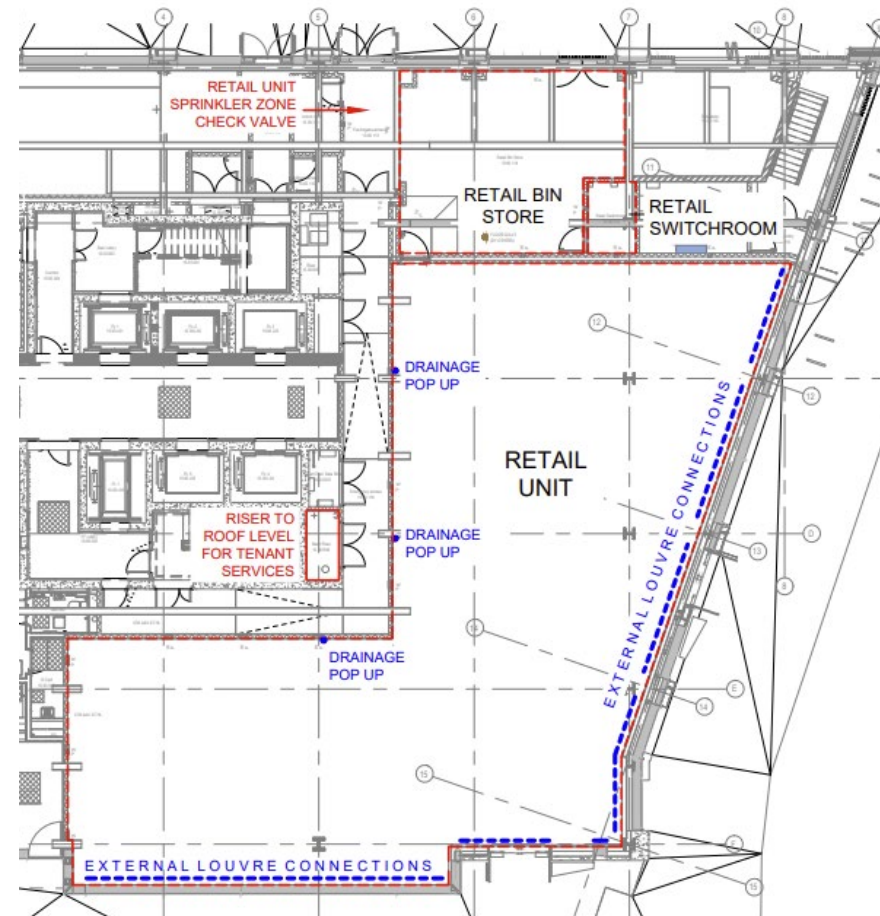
RETAIL UNIT SERVICES CONNECTIONS
